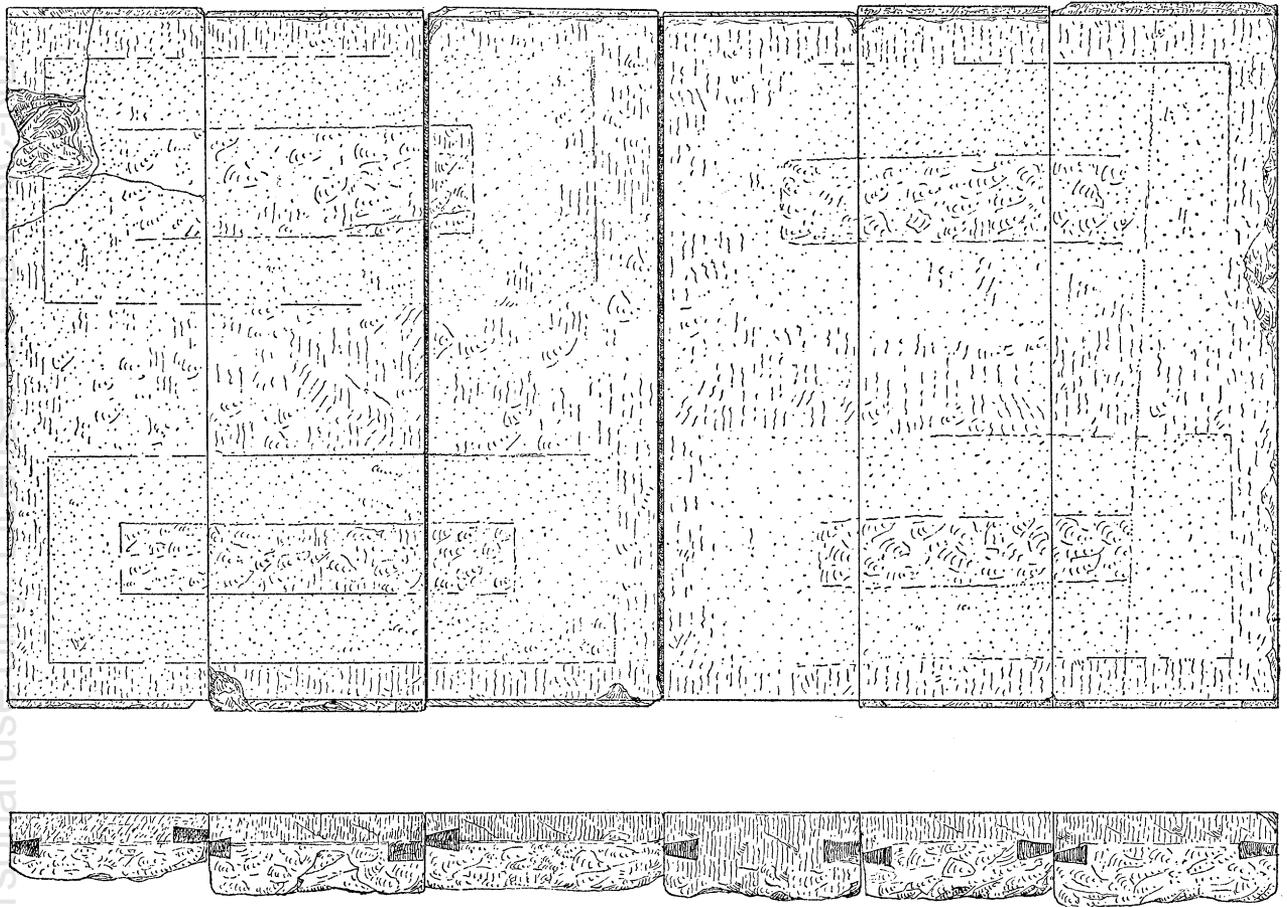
STELAI PLATFORM, PLAN AND SECTION
